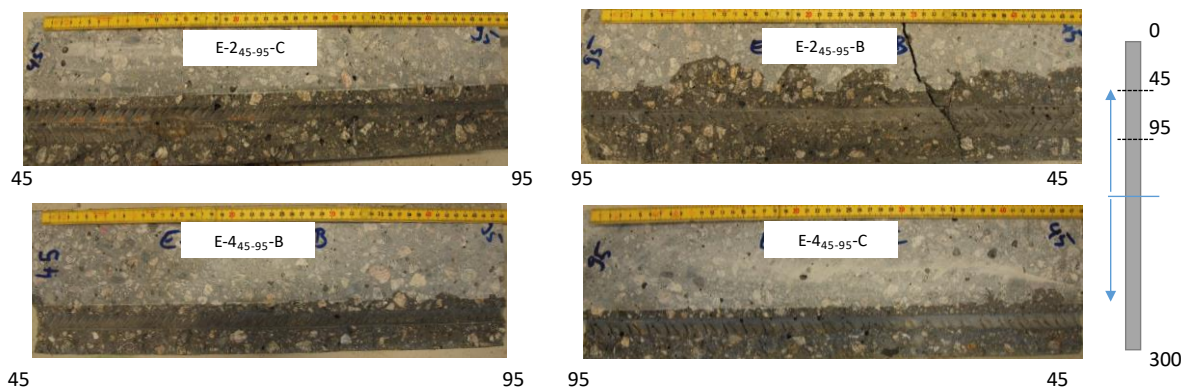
Steel-concrete interface of beam E section 45 to 95 cm. White precipitate at the cracks and spread over the steel-concrete interface. Superficial rust
